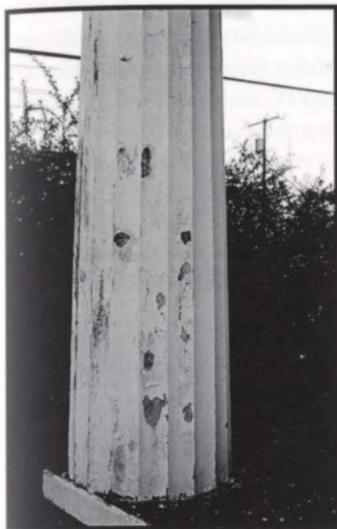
Detail of northern elevation column showing extent of paint degradation and loss.
